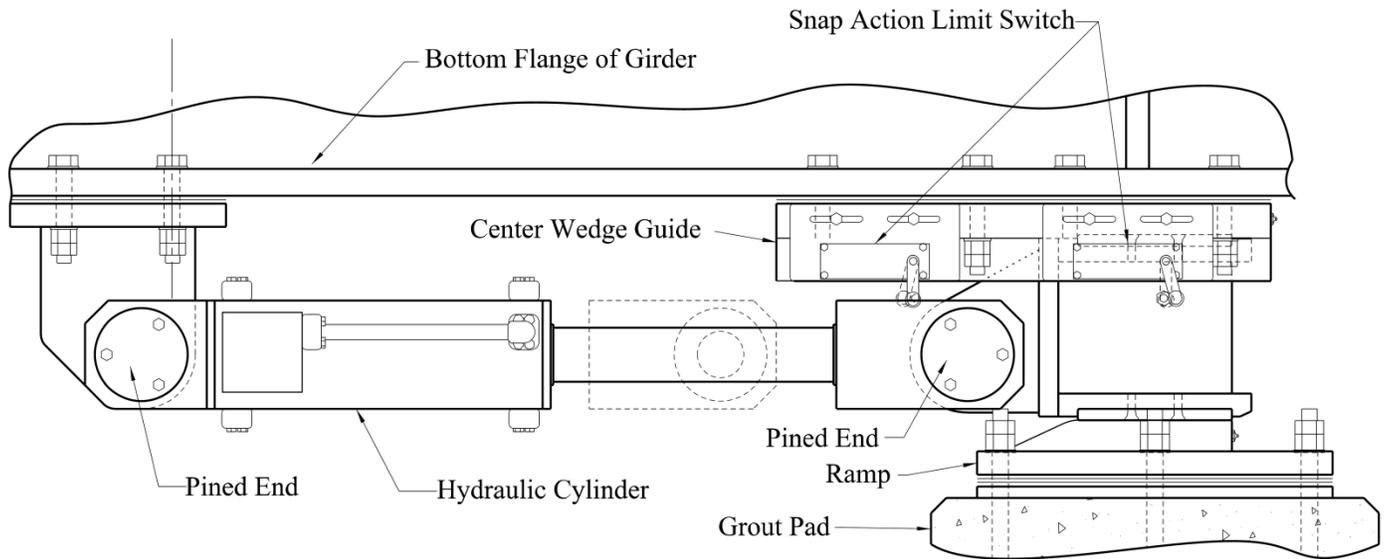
Typical Center Wedge Assembly
